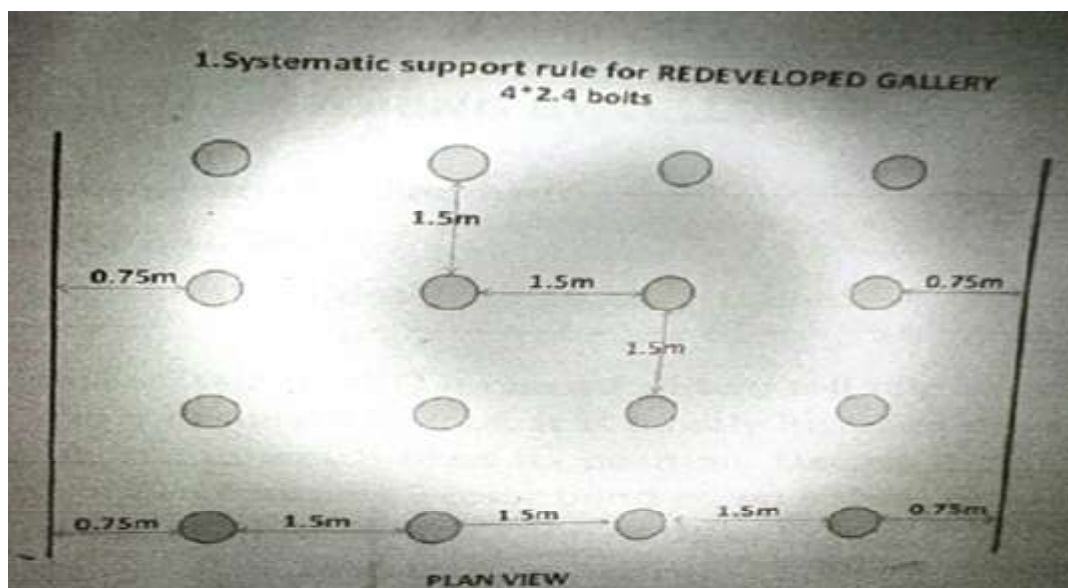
Plan View of Roof Bolting in Re-Developed gallery (Churi Mine, CCL)
